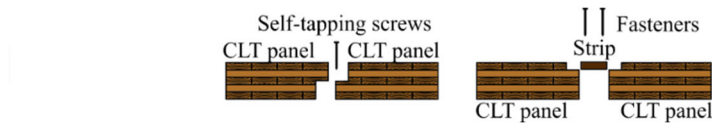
Half-lapped joint (left) and single spline (right) connections of CLT floors
